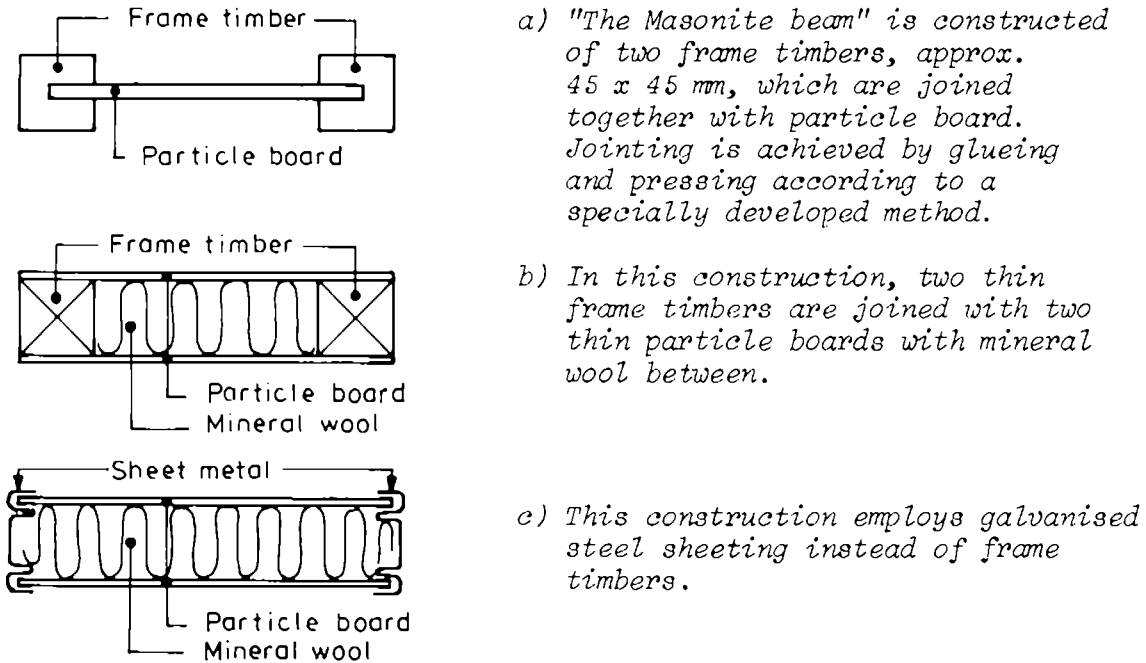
Examples of light frame constructions used in walls with thick insulation.
